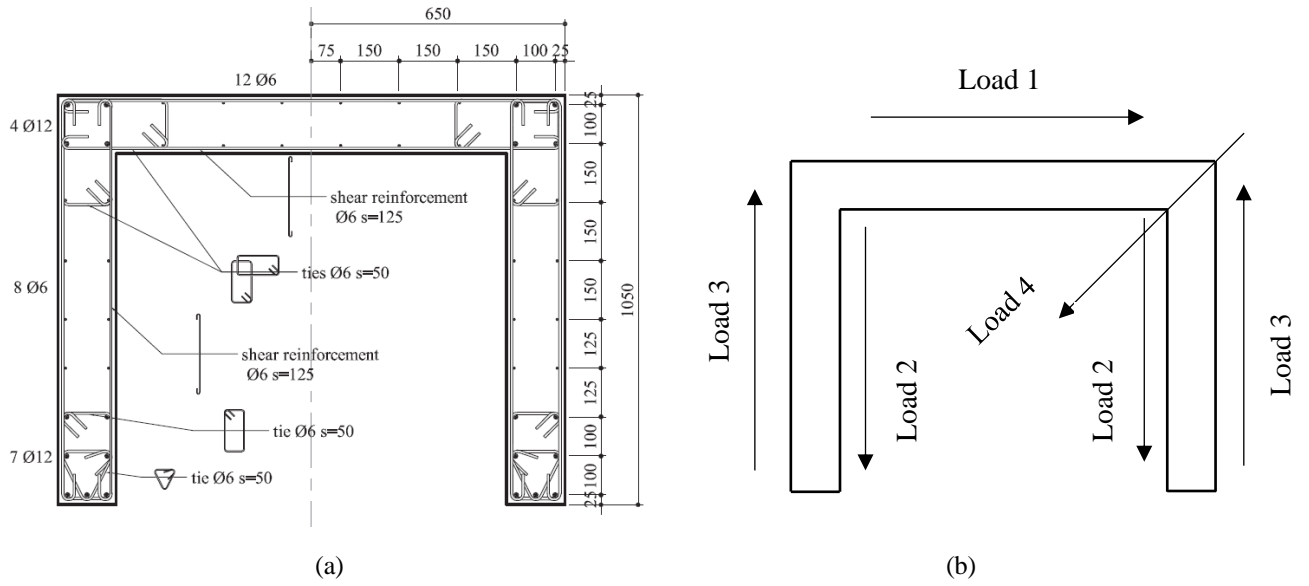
Core Wall by Beyer (2007) (a) core wall details; (b) load direction
